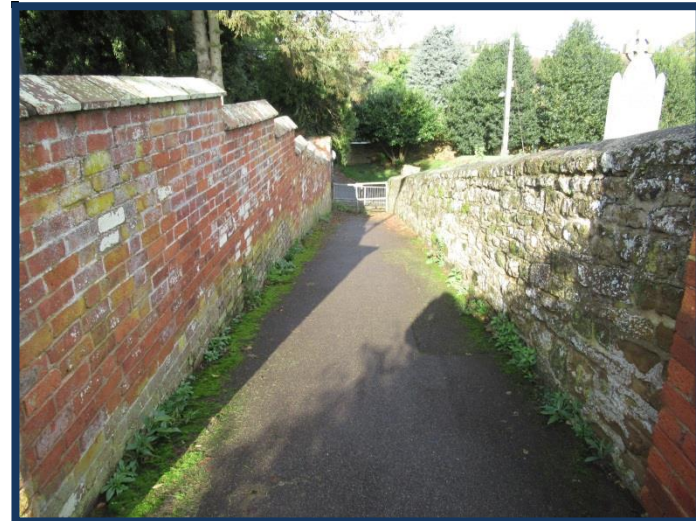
Walls on the footpath between Welford Road and Violet Lane
